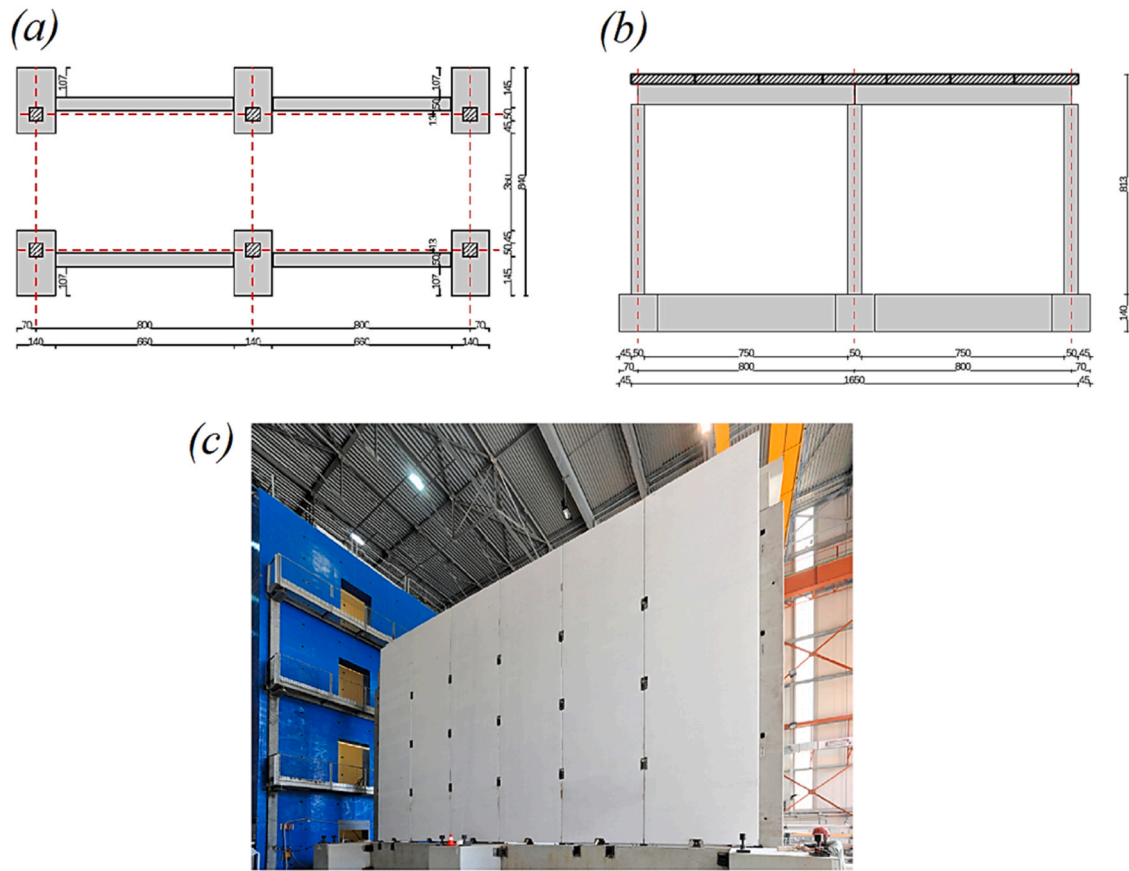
Single-storey prototype building tested at the ELSA Lab: (a) planar layout, and (b) vertical section view of the main frame; (c) picture of the arrangement of the dissipative rocking panels installed along longitudinal frame. Adapted from [31].
